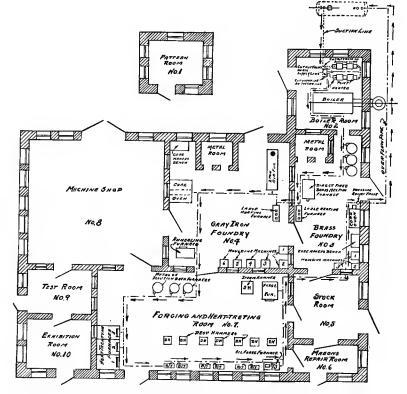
Plan layout of building at Lincoln Memorial University, showing boiler room, foundries, machine shop, etc.
